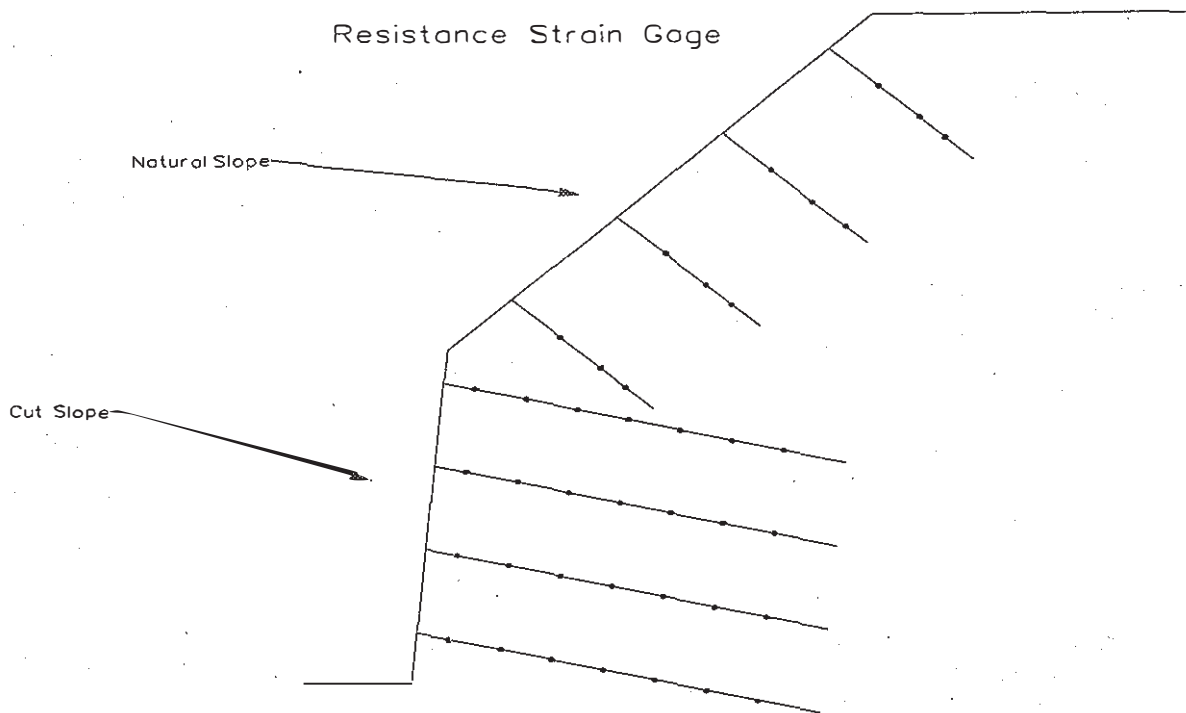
Section through Nailed Slope Showing Typical Soil Nail Instrumentation
